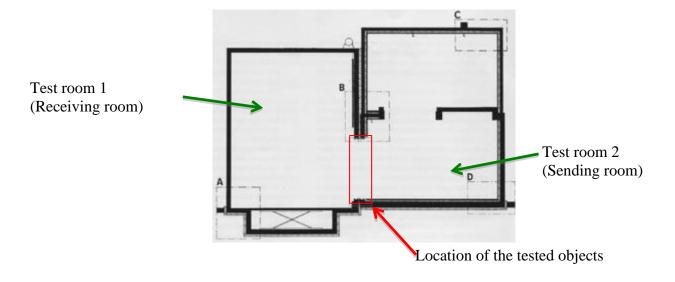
Section of the laboratory with the sending room (1st floor) and the reverberation room (1st floor) together with the location of the test specimens.
